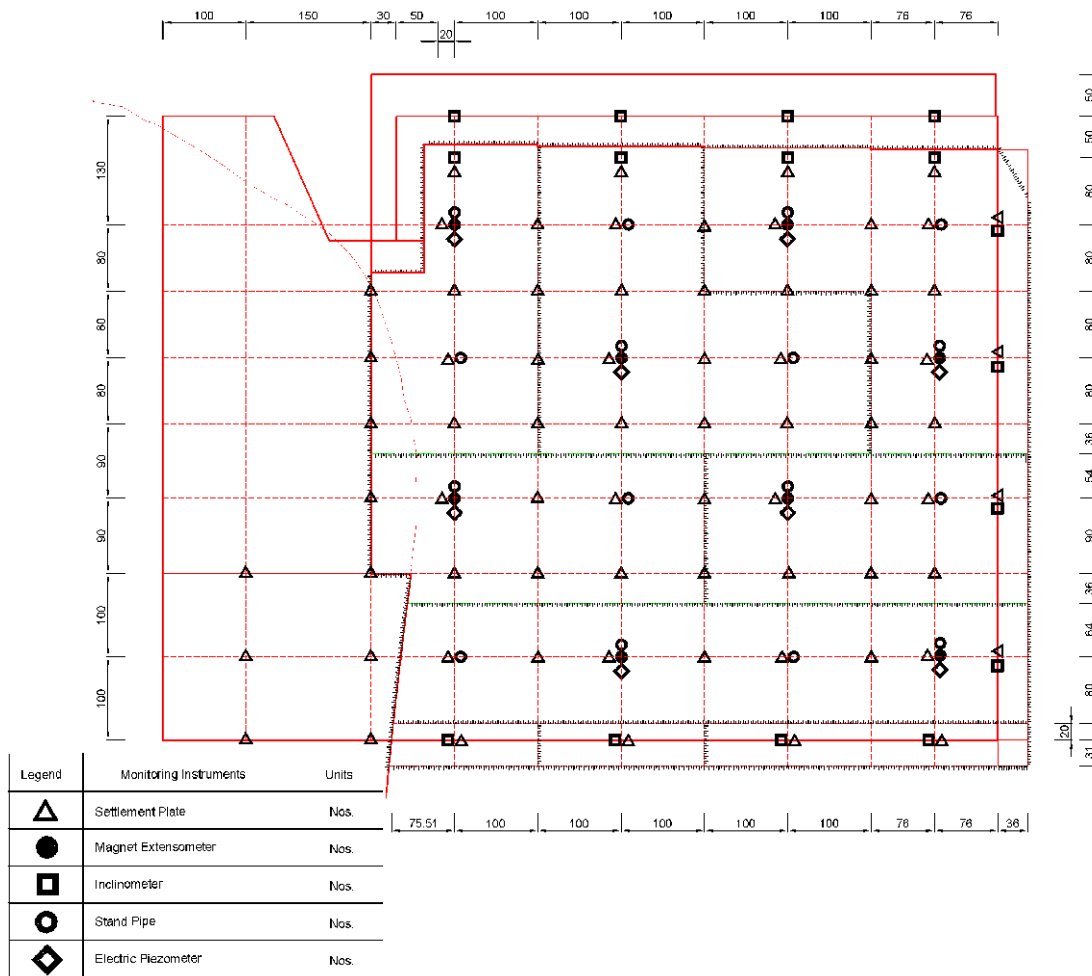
Monitoring Instrument Layout Plan for Subsoil Improvement
